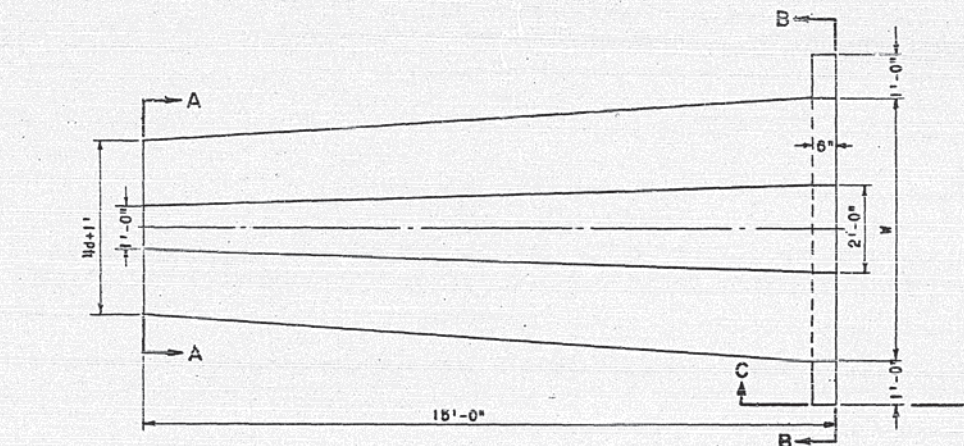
DETAIL OF ANCHOR WALL FOR PAVED DITCH
